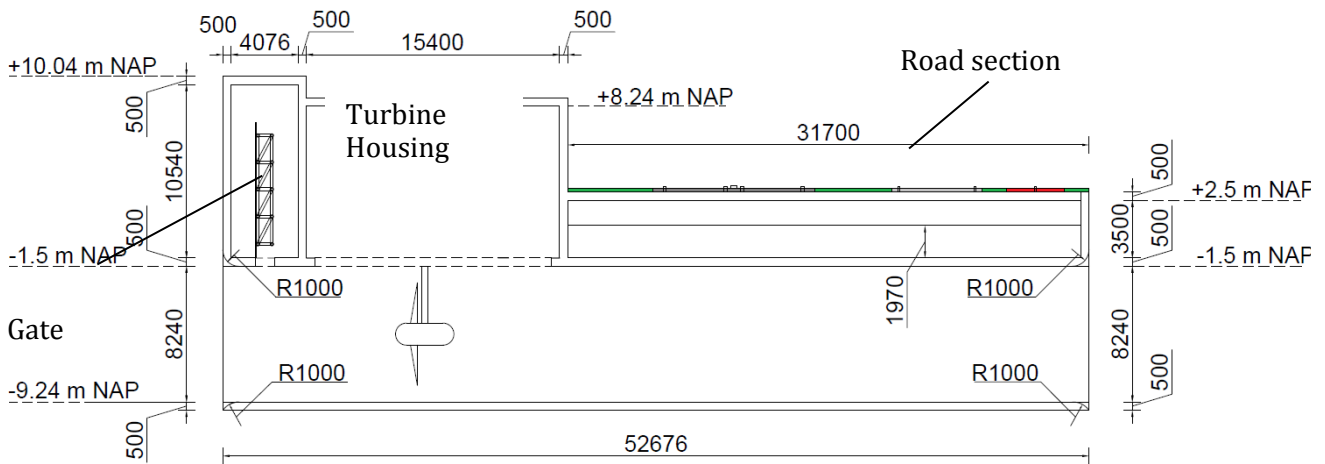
CROSS SECTION TIDAL POWER PLANT IN TRANSVERSE DIRECTION
